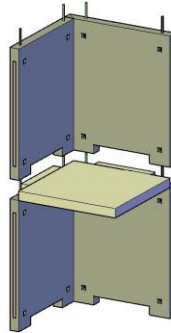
Load-bearing wall resisting system with dry connections for residential buildings: a) 3D schematic layout.
